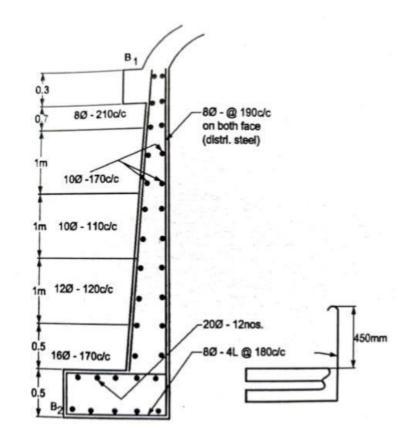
Reinforcement details for side wall and bottom ring beam
